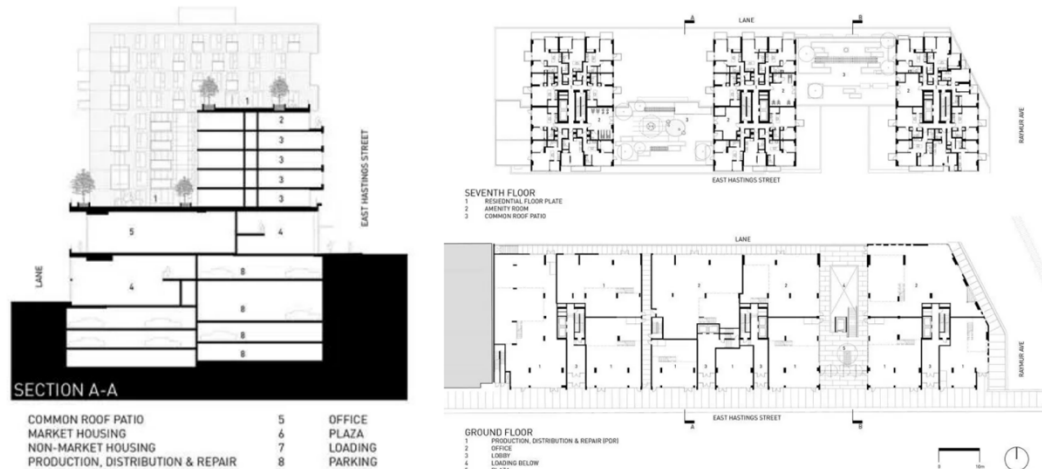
Strathcona Village Building and Floor Plans, Source: Ng, *Mitigating Industrial Land Use Impacts Through Building and Site Design
